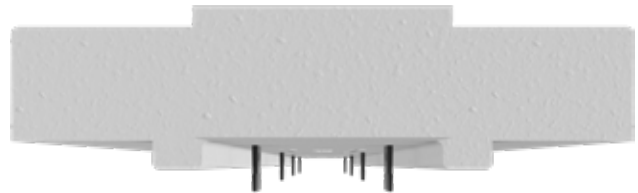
BuildBuck end view showing factory connection and plastic "T" anchors that embed into the concrete securing the buck to the wall.
